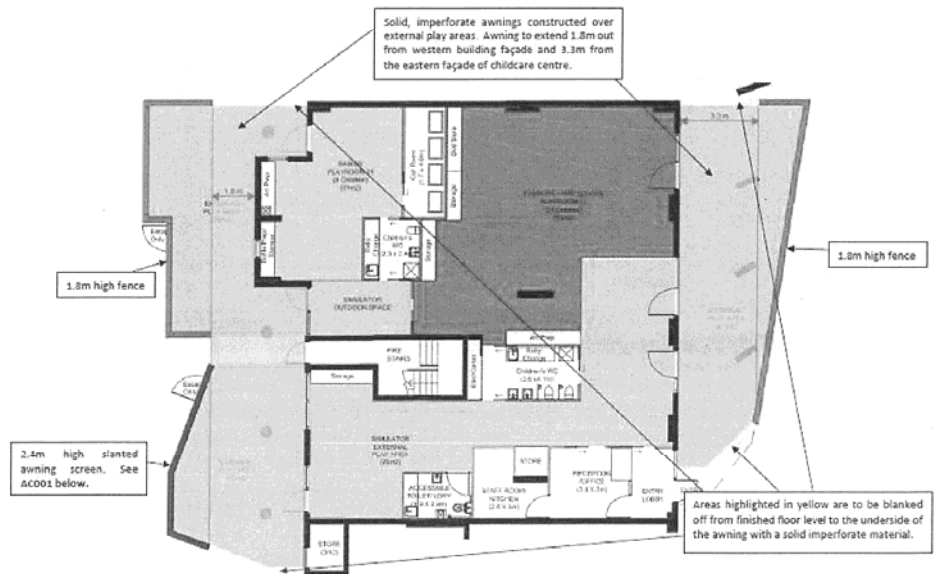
Recommended Fences and Awning Structures (to be read in conjunction with section 5.5.3)
